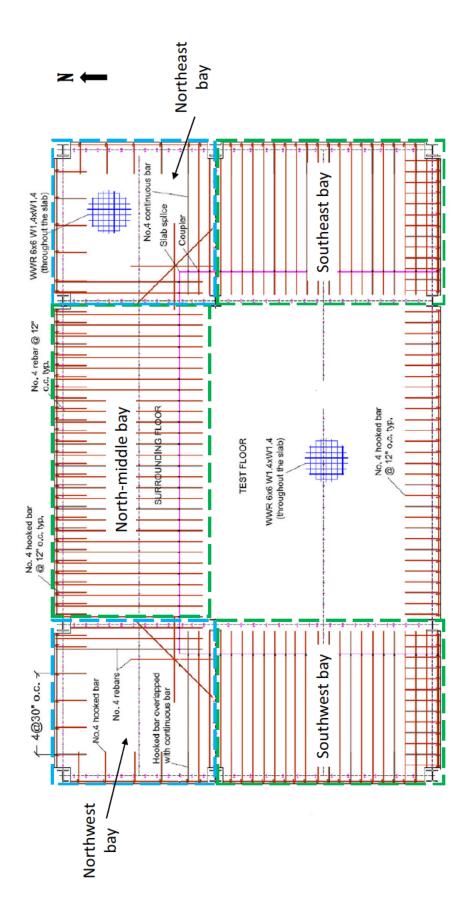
Steel reinforcement layout for the first floor for the CF1 Test.
